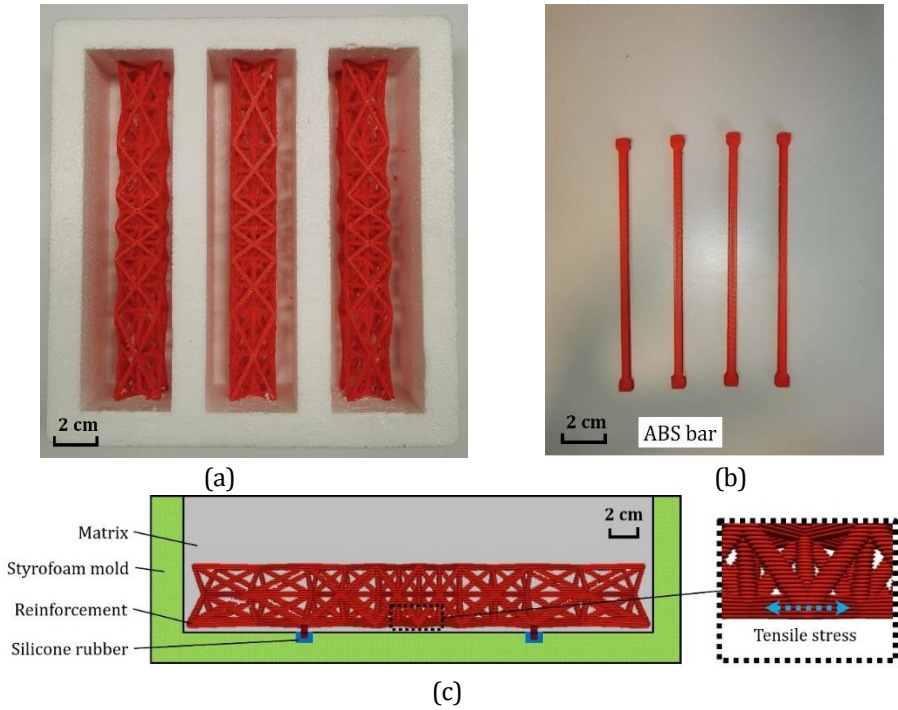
Schematics of a) printed specimens and Styrofoam mold; b) the printed ABS bars; c) positioning of specimen in Styrofoam mold during casting
